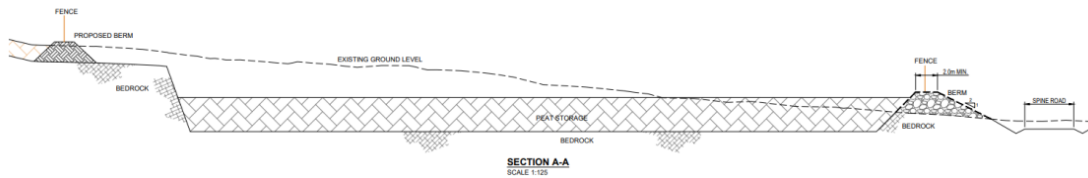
Cross Section of Borrow Pit South of Turbine 15).
